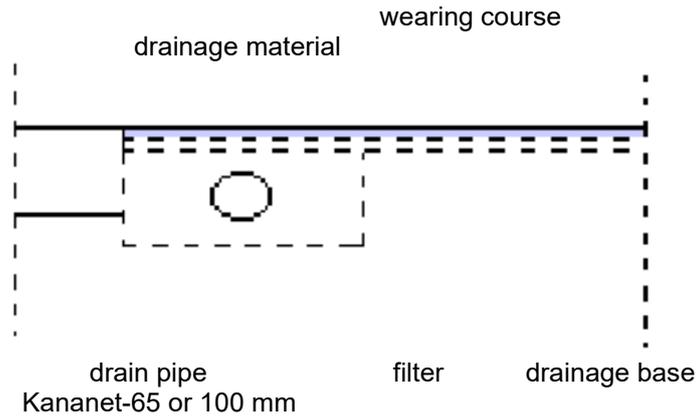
Schematic cut of the airport pavement drain: for narrow runways, just two parallel drains on the edges of the pavement are sufficient; on wide runways, use one or more fishbones.
